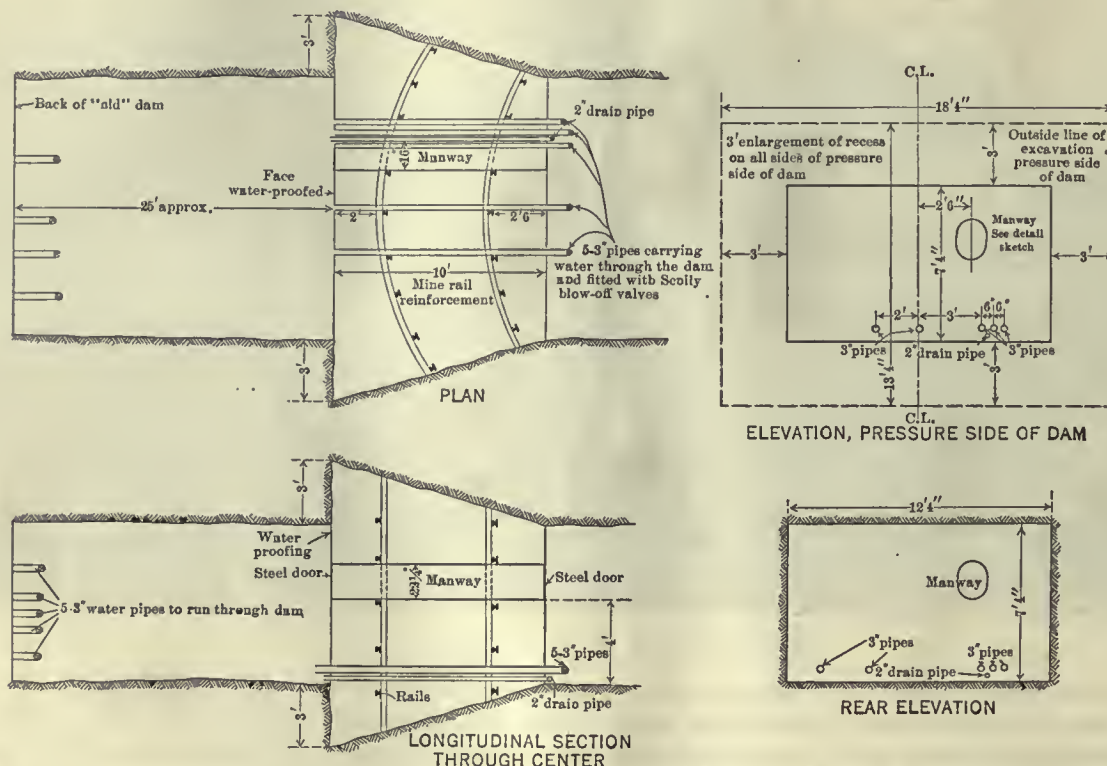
REINFORCED CONCRETE BULKHEAD FOR 16TH LEVEL
